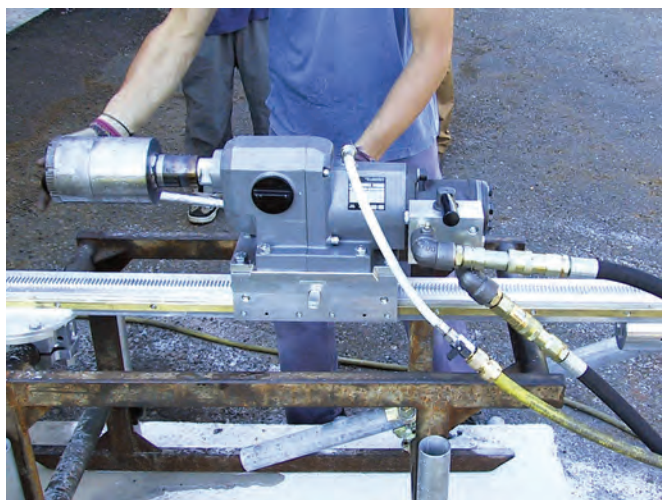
Cordiam Hydro 25 rotary drill motor unit.
